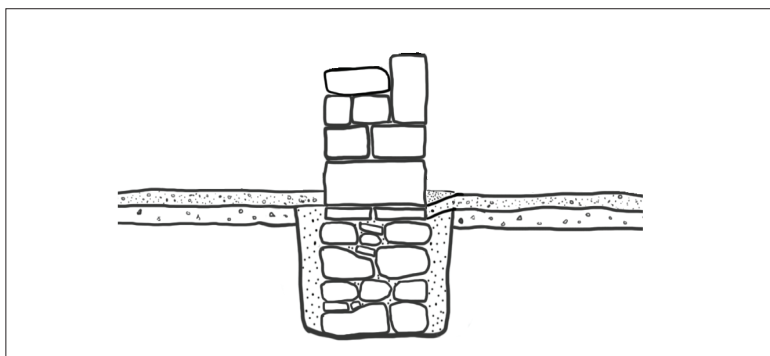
Wall with foundation trench with multiple fills, in section. Drawing J. Herbst
